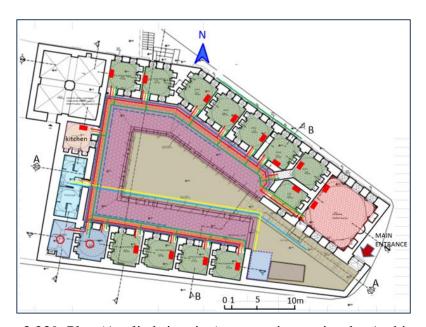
Plan (Applied situation), restoration project by Architecture Foundation, 2010 (Archive of DGF)
